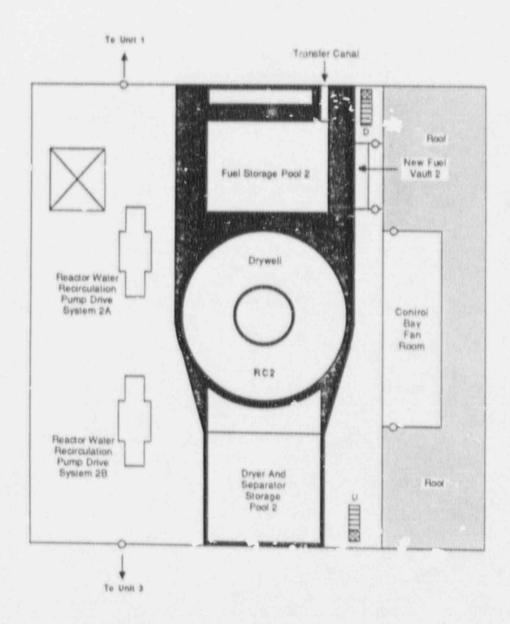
Browns Ferry Unit 2 Reactor Building - 539 ft. Elevation.
